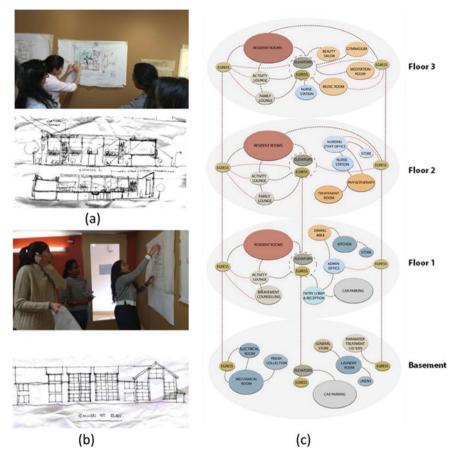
Design renovation process of program, plan, and elevations. a Shows plan revision sketches; b shows the development of the elevations to match the local context; c shows the revised program by floor to relocate the existing programming formerly in the demolished box
